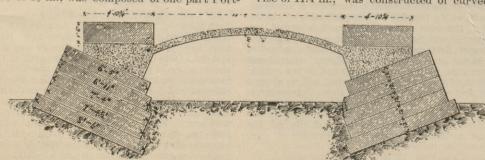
CONCRETE ARCH WITH MASONRY ABUTMENT.
